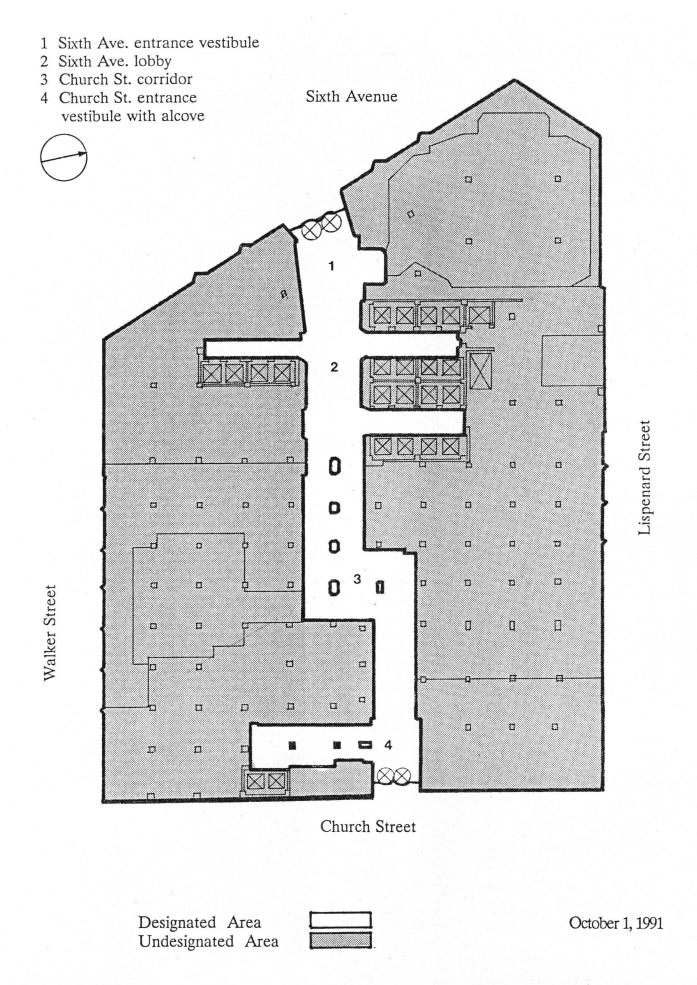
LONG DISTANCE BUILDING, FIRST FLOOR INTERIOR
